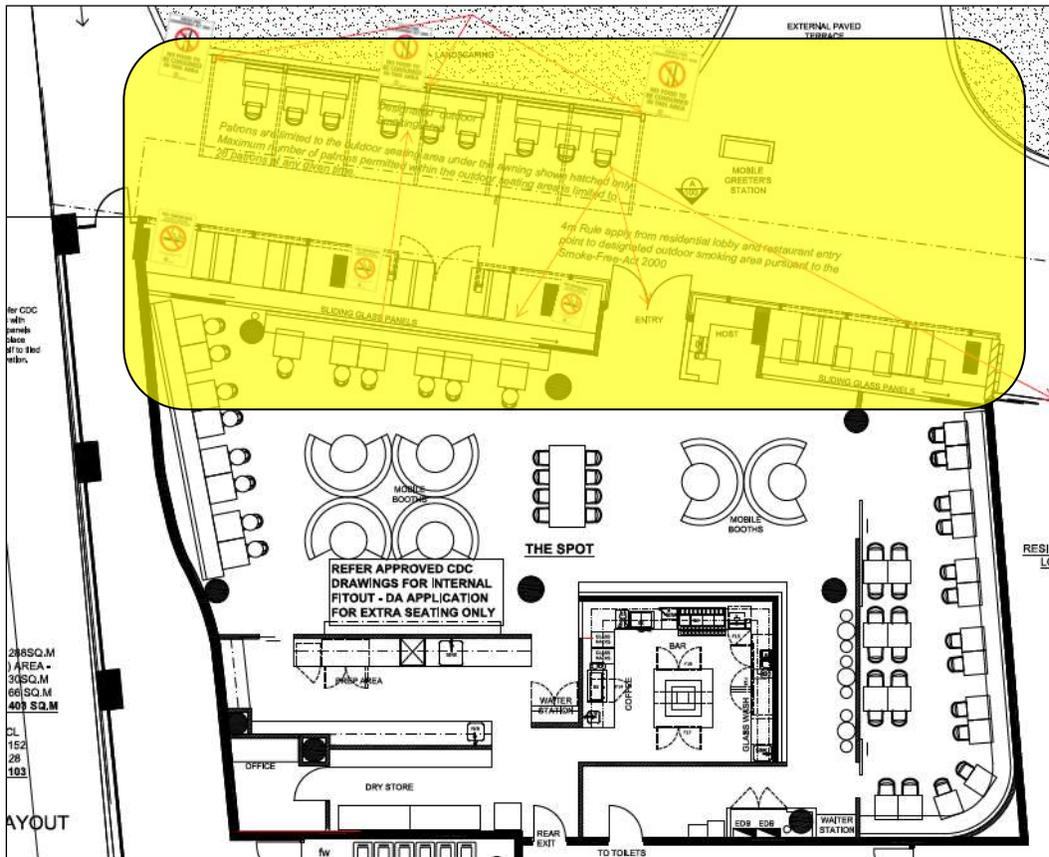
Floor plan showing the additional indoor and outdoor seating areas (highlighted) (source: TS-DA-002 Rev E prepared by Brad Ward Design).
